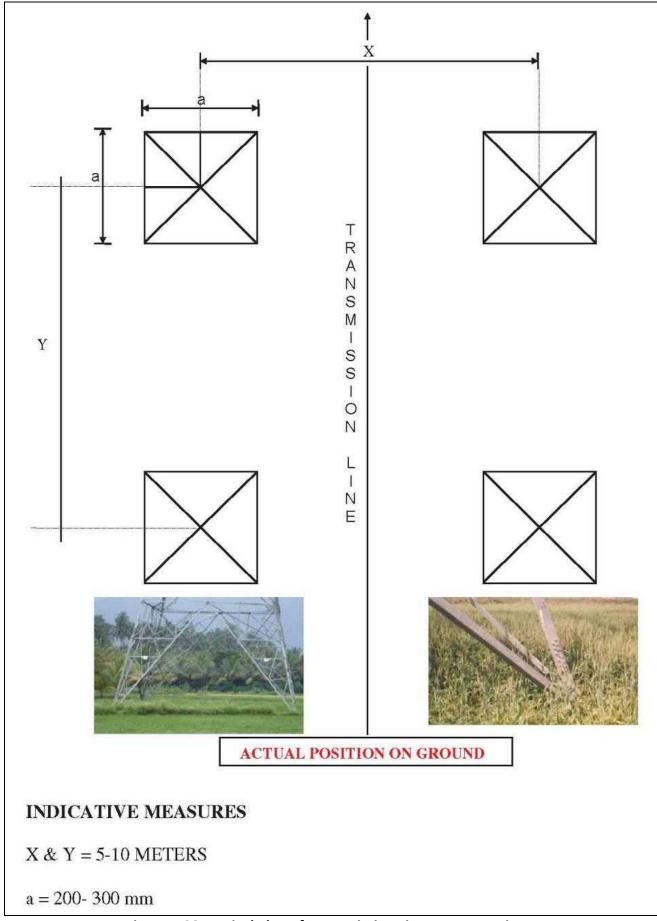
Typical Plan of Transmission Line Tower Footing
